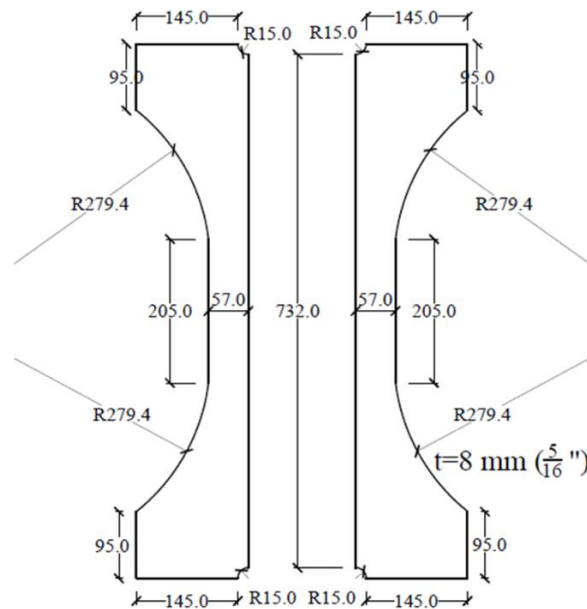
Dimensions of the longitudinal stiffener in millimeters.
